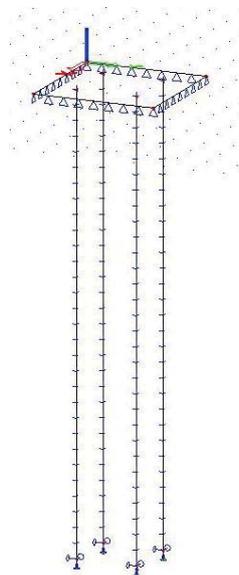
Example of a capped pile foundation in Scia Engineer
